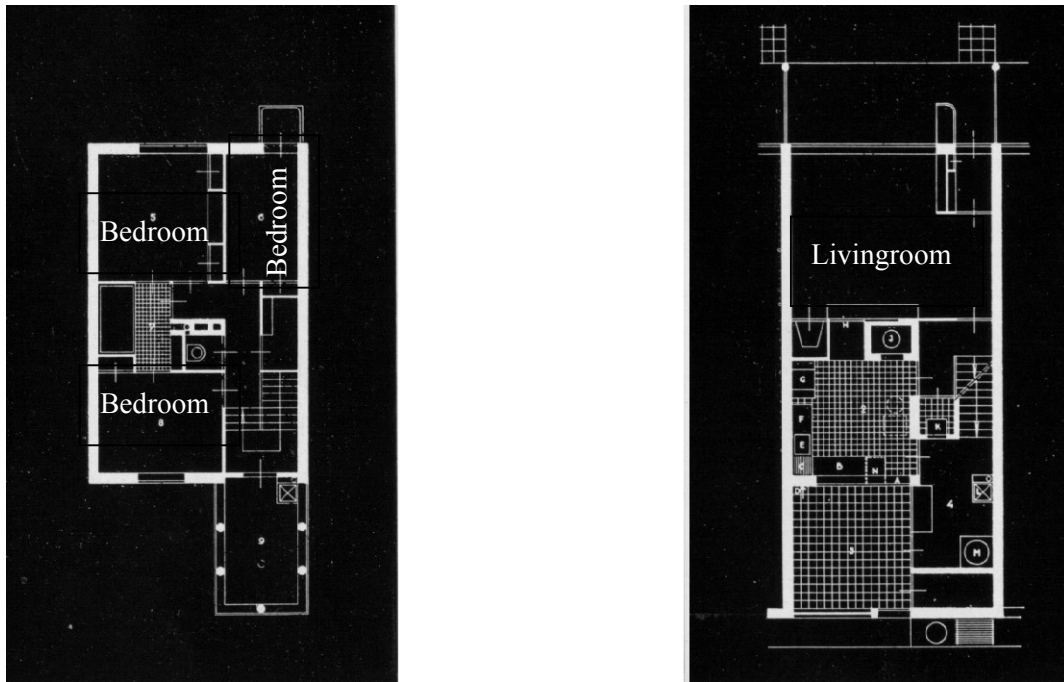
Row Houses, Weissenhofsiedlung, Stuttgart, 1927, plan layout
